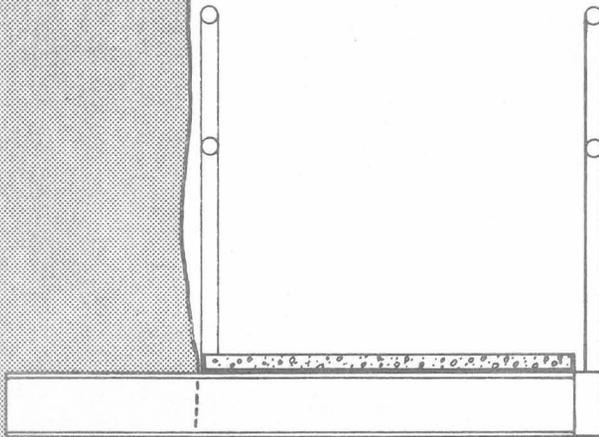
Cross-section of walkway; estimated construction-equipment costs.
